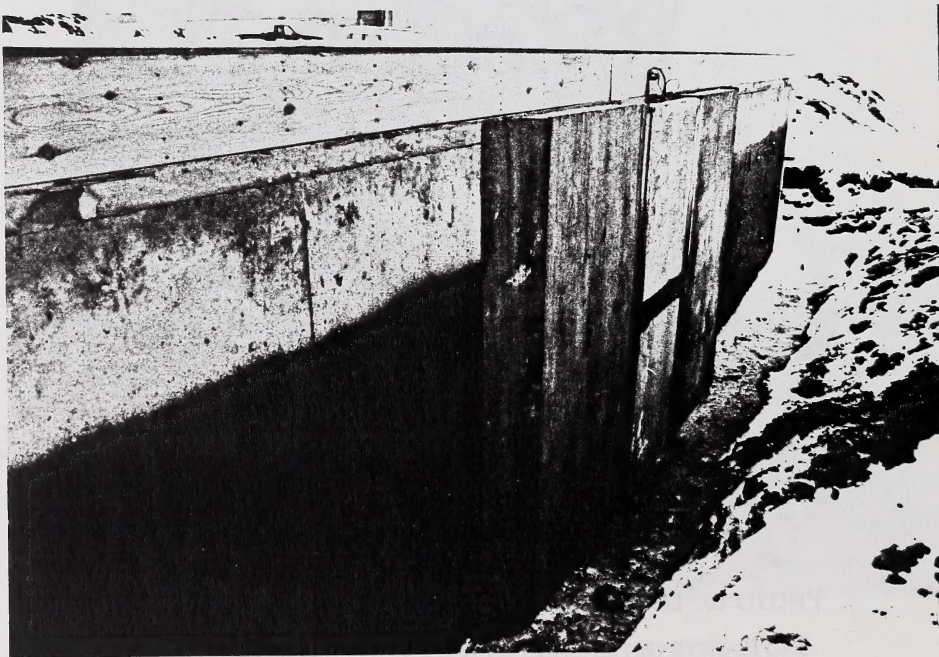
LOAD CELL MOUNTED ON FOUNDATION WALL
